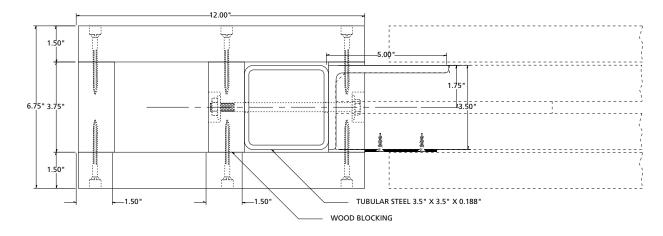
/2 x 3-1/2" x 3/16" POST ASSEMBLY FRONT ELEVATION
